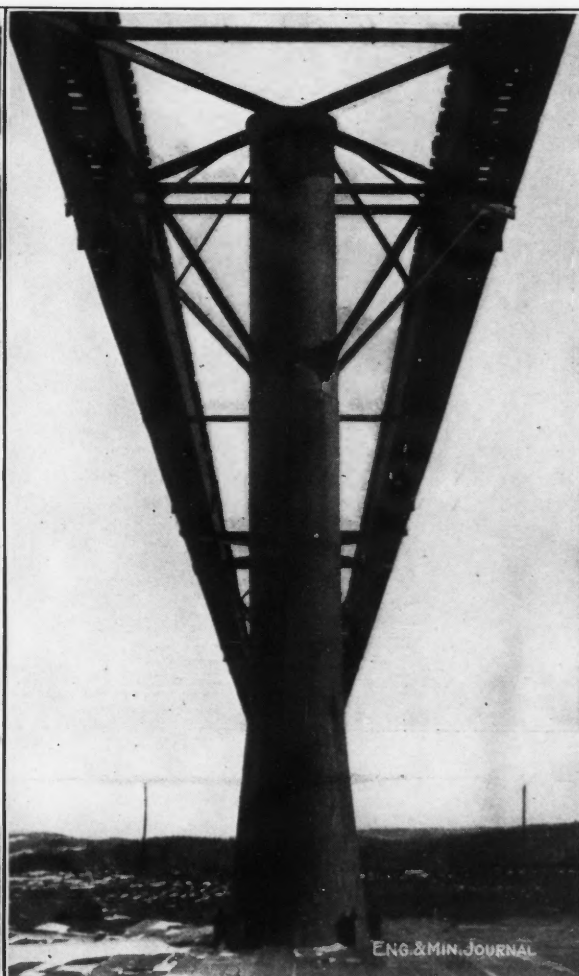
A COLUMN OF THE NEGAUNEE TRESTLE, LOOKING ALONG THE TRESTLE LENGTH
